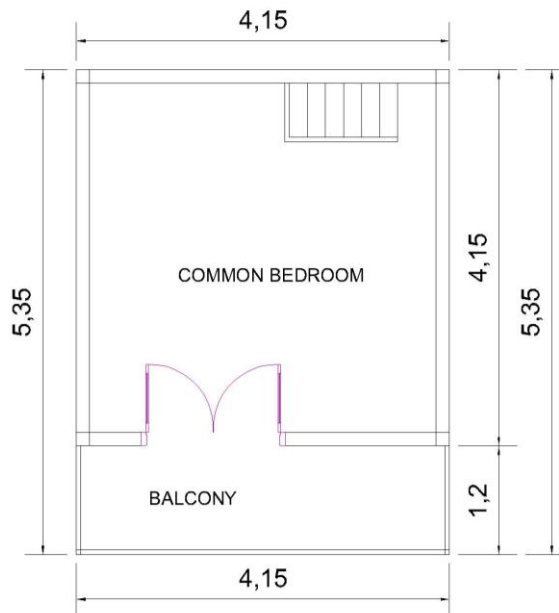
Floor Plan of Mixed Type (2nd Floor)
